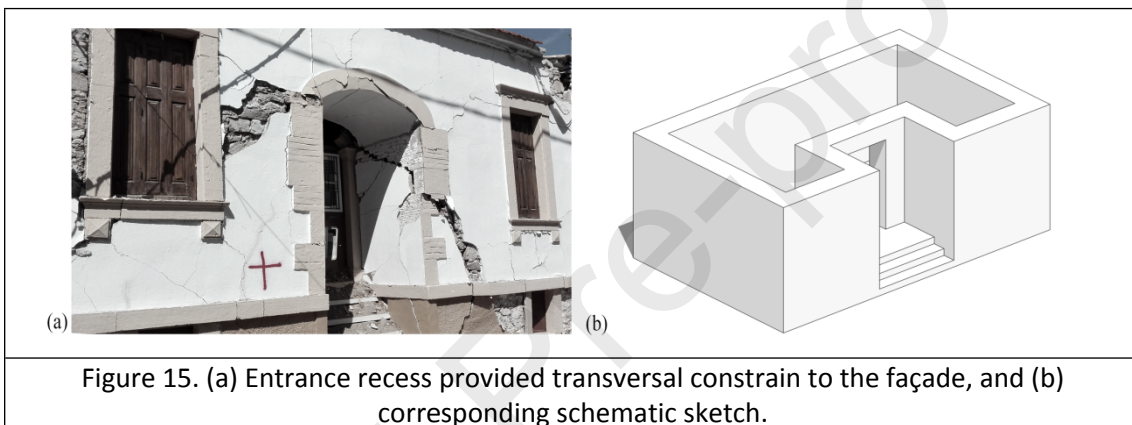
(a) Entrance recess provided transversal constrain to the façade, and (b) corresponding schematic sketch.
